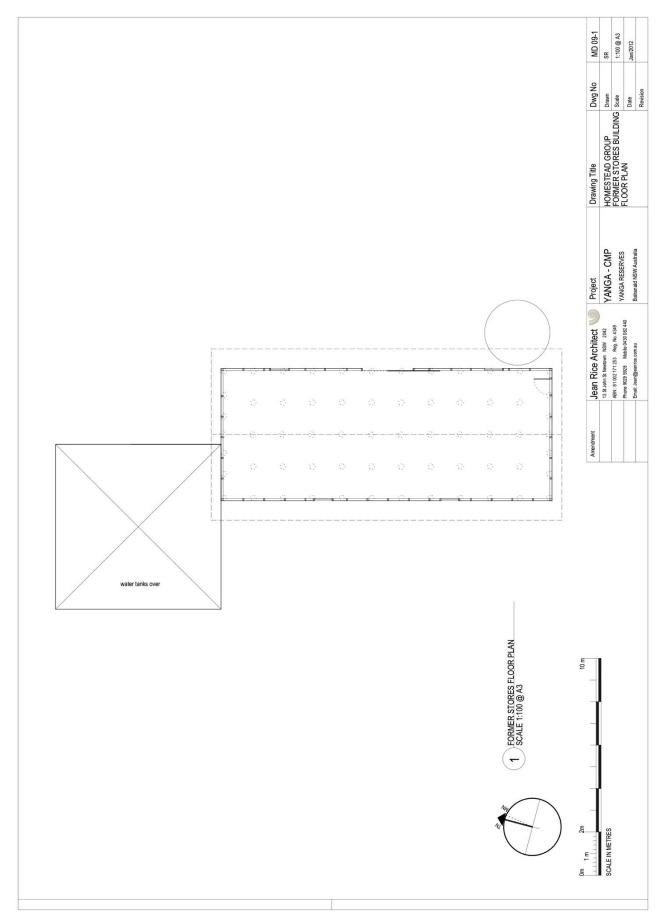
Homestead Group Former Stores & Water tank tower floor plans. Jean Rice Architect, site assessment 2009.
